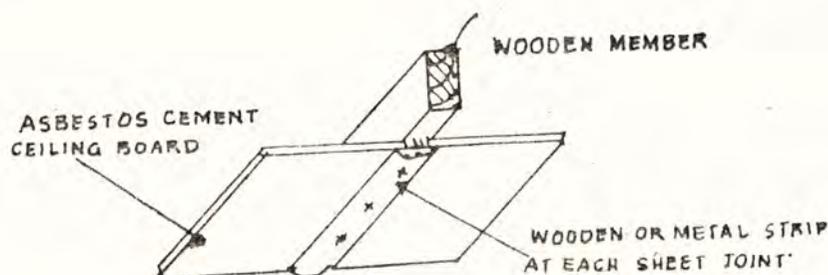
FIXING ASBESTOS CEMENT CEILING BOARDS TO WOODEN MEMBERS
